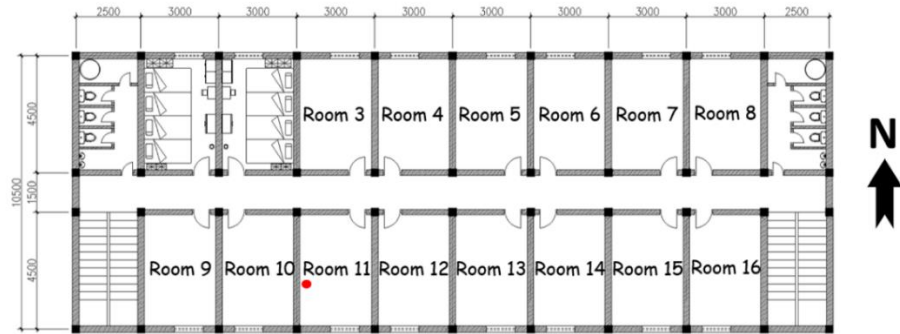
Floor plan and surroundings of building A1, room 11 is the case study unit located on 2nd floor under the roof (the red dot is where the sensor was installed).
